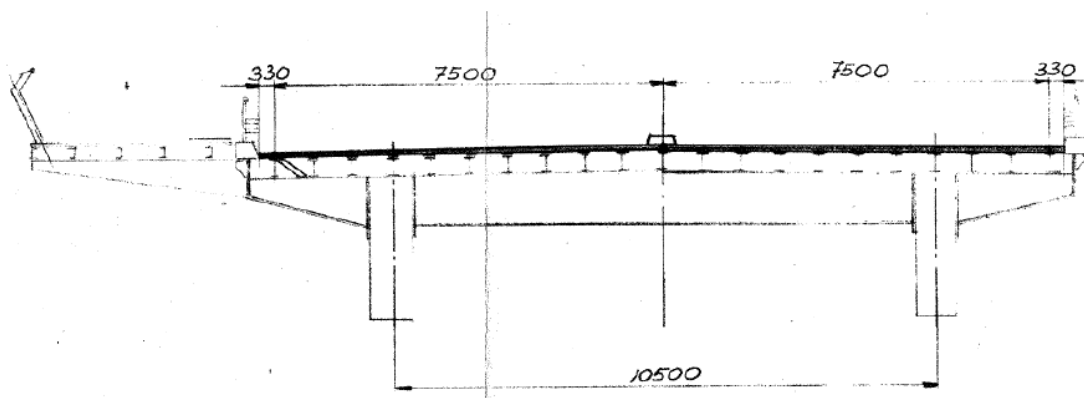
Cross-section of the Beneden Merwede Bridge after the widening in the 70's [48]
